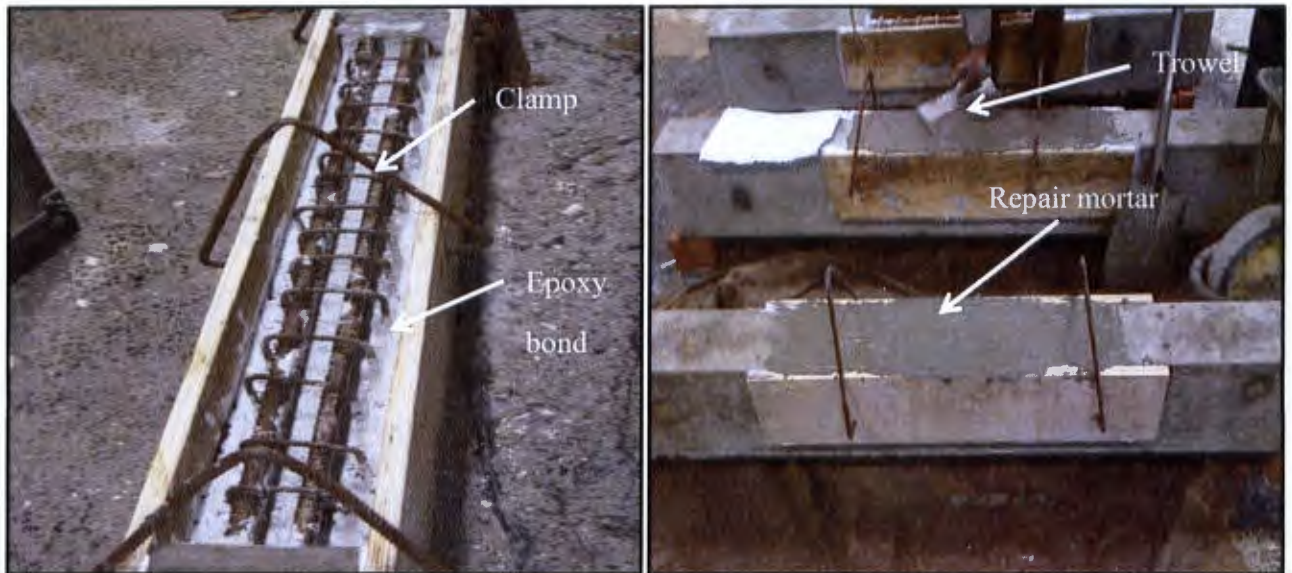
Setup of the wooden mould and adhesive epoxy application (left); patch repair application (right)
